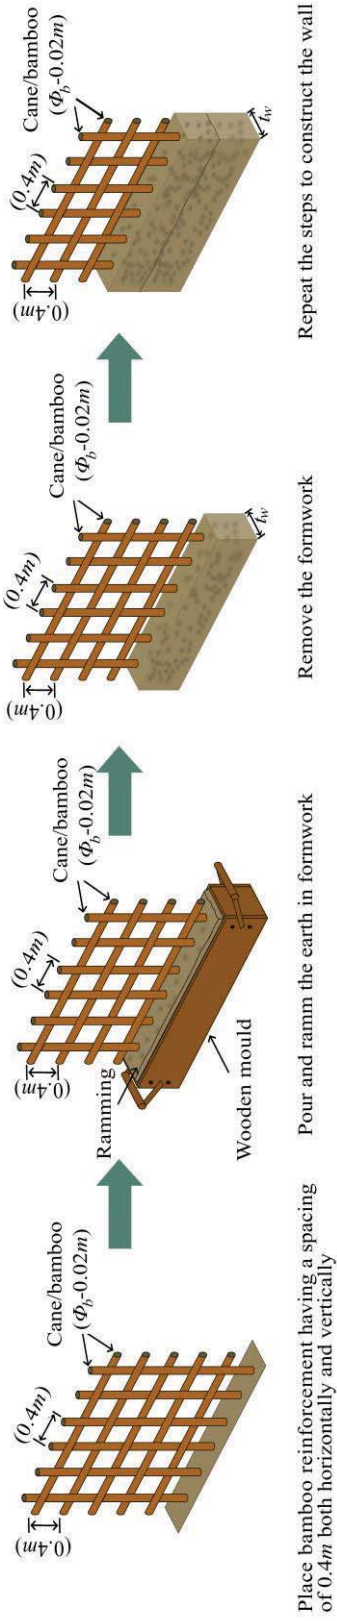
Provisions of bamboo reinforcement for new rammed earth buildings
